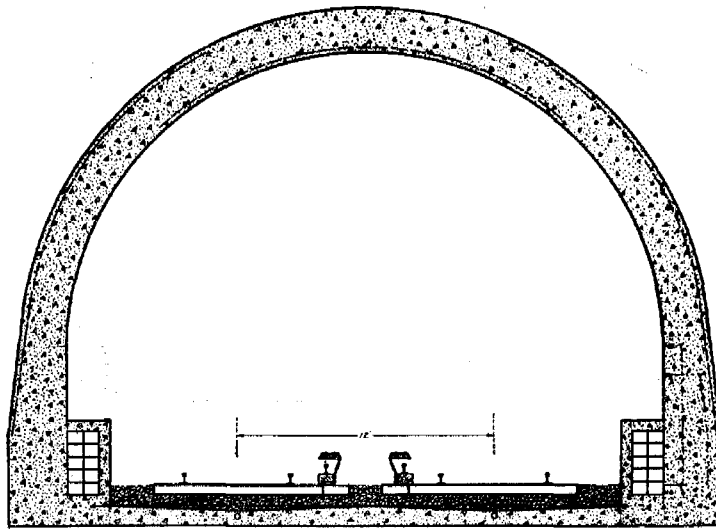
Semi-circular type tunnel—Typical cross-section.
